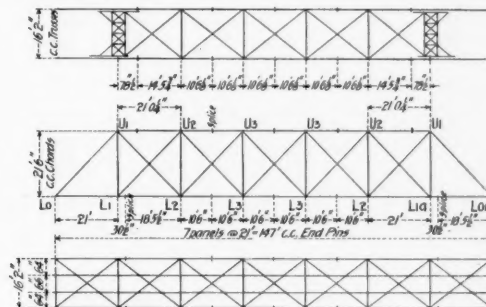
B.—General Diagram, One Span Atbara Bridge.
